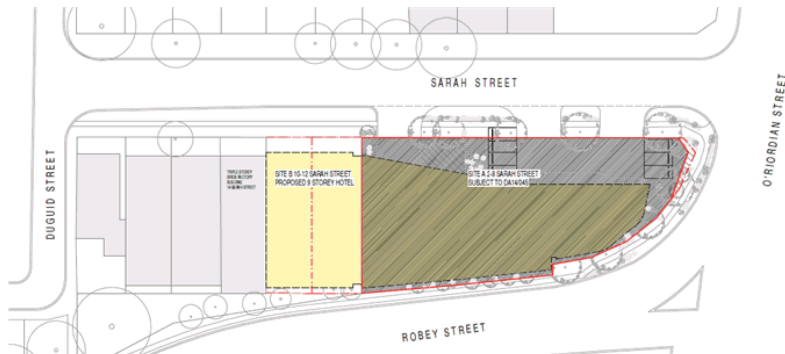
Proposed Site Plan (showing 2-8 Sarah Street hatched in grey)
